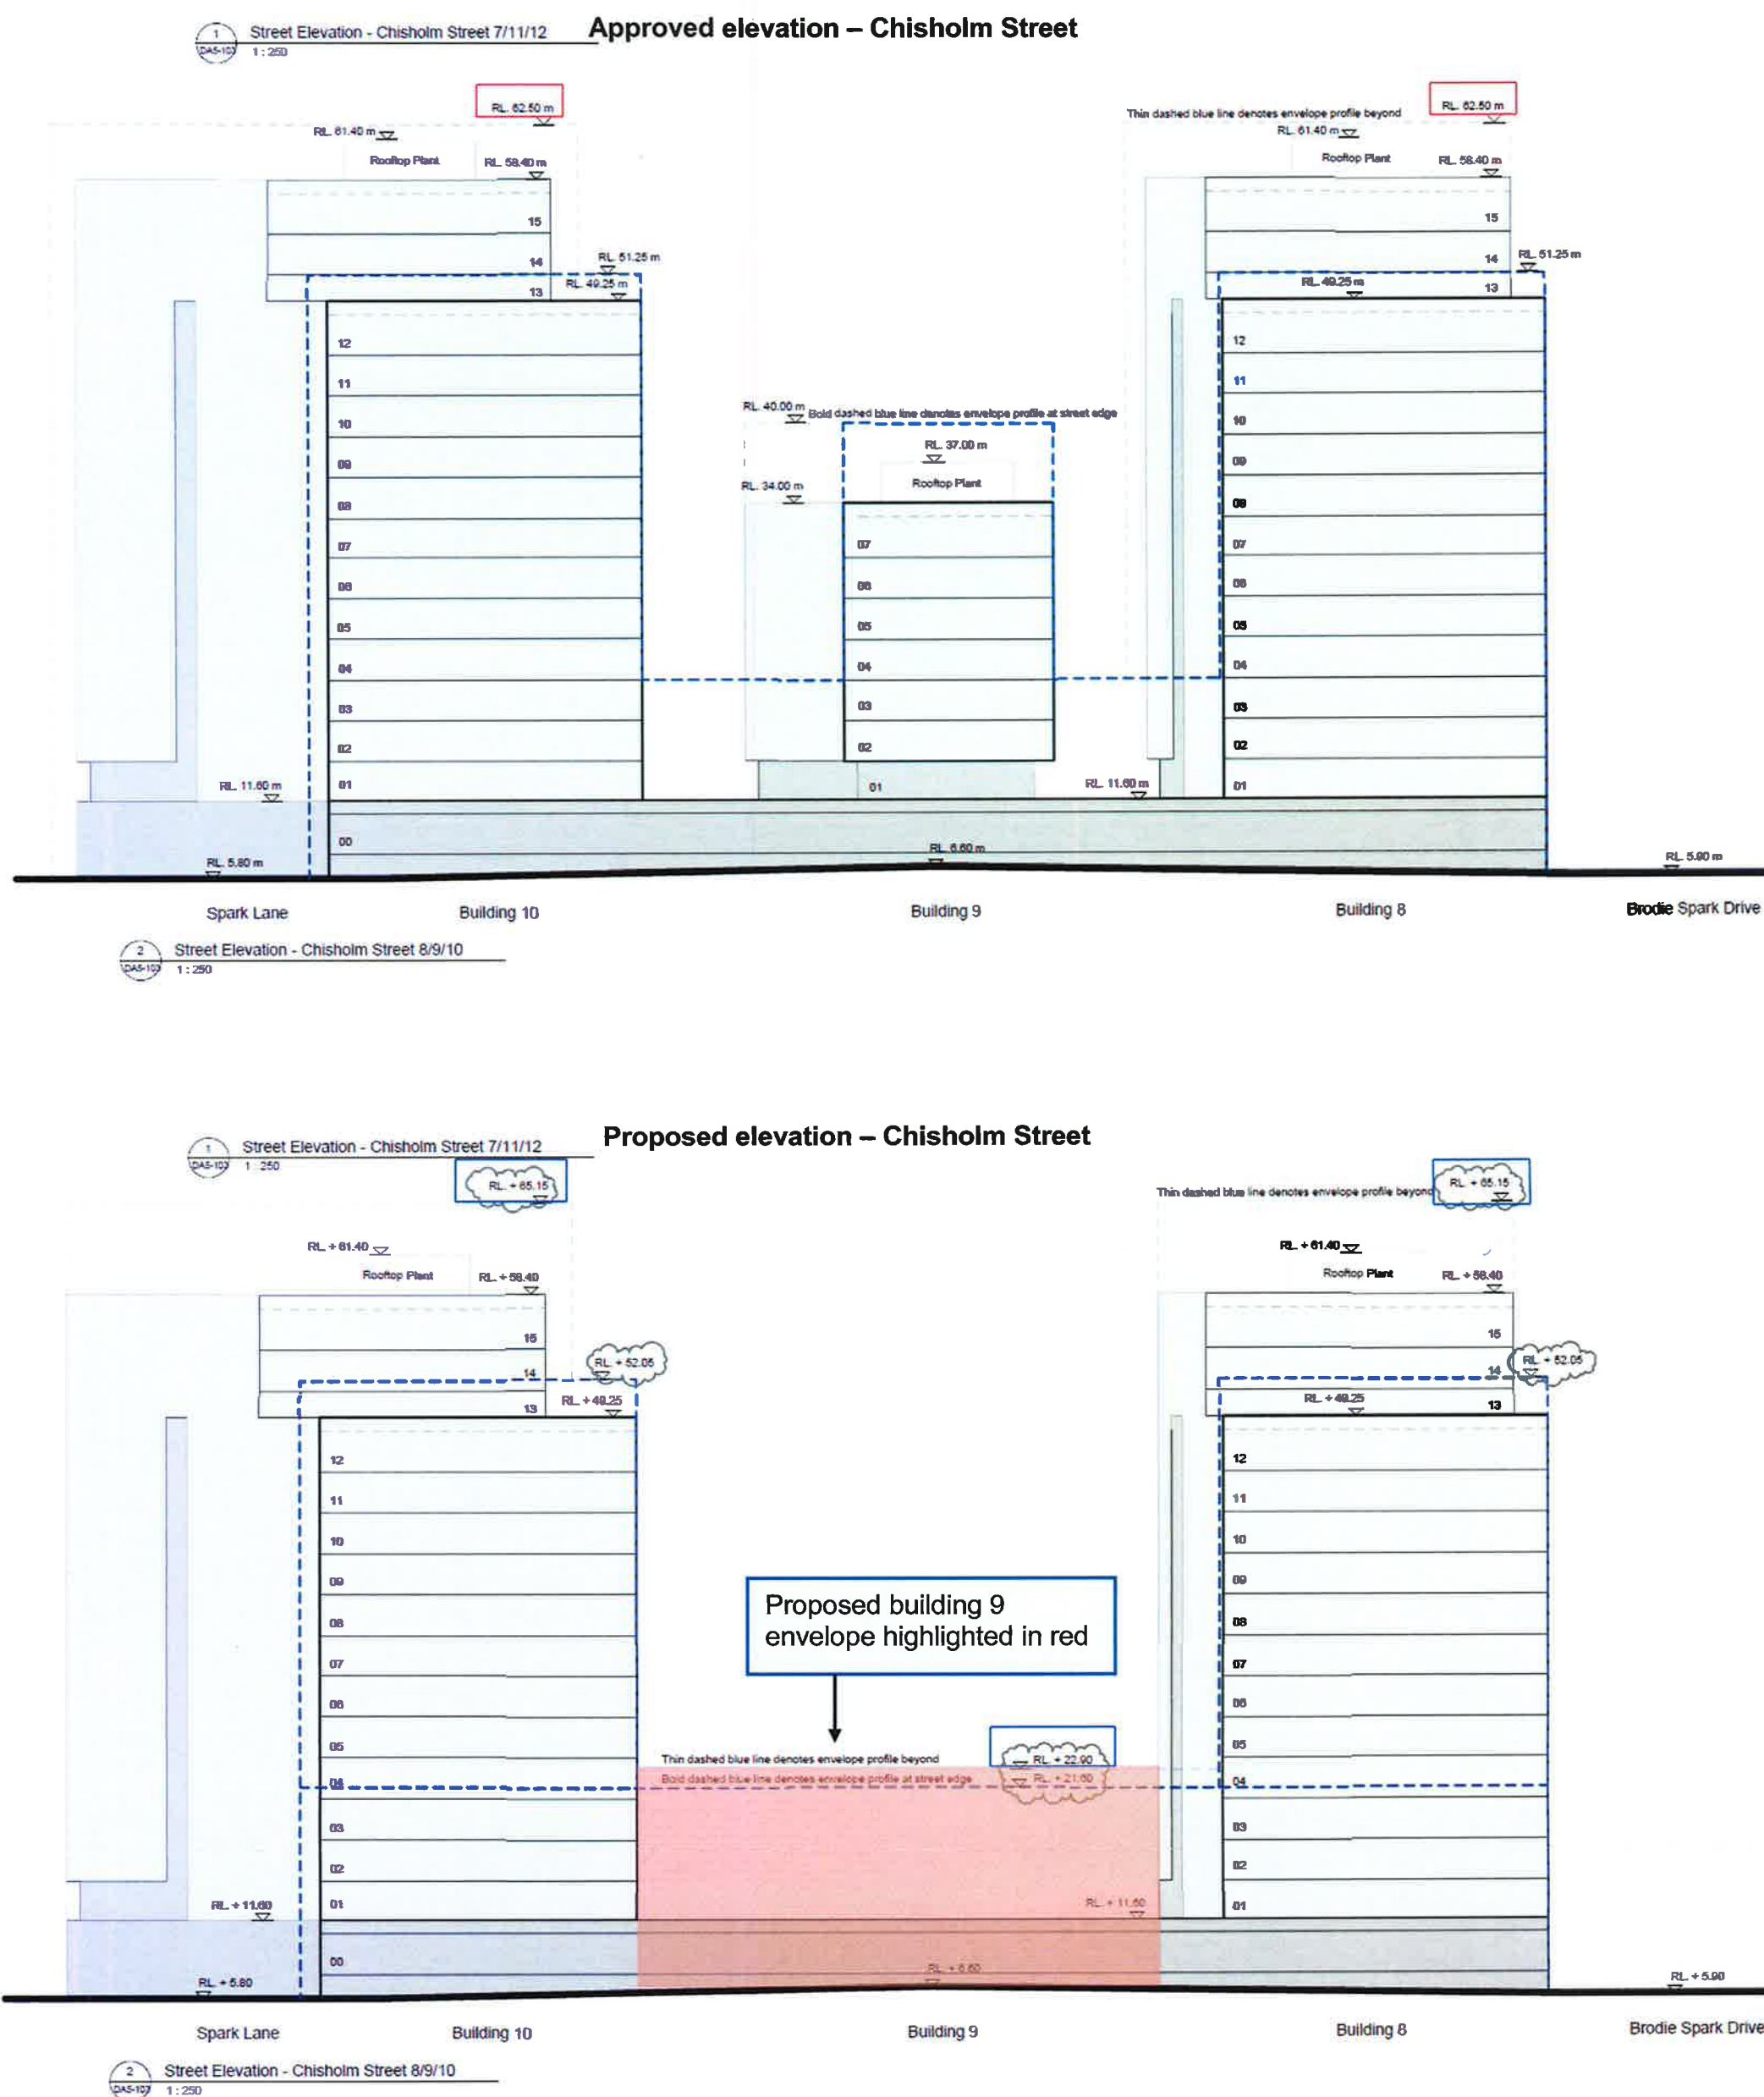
Comparison of approved and proposed elevation of buildings 8, 9 and 10 from Chisholm Street
